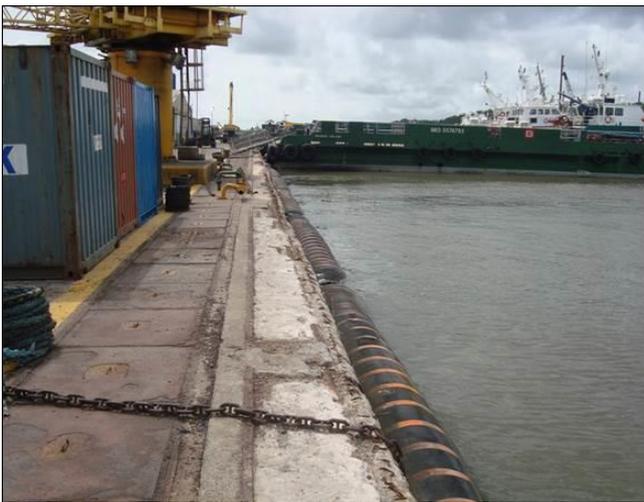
Corroded steel reinforcement bars and spalling of concrete covers at Quay deck slab and facing
